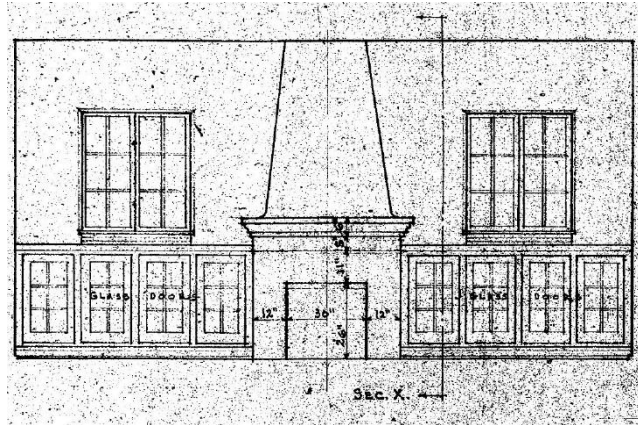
Drawing of fireplace mantel and built-ins in reception room (W. Horace Austin, Sheet 7)
